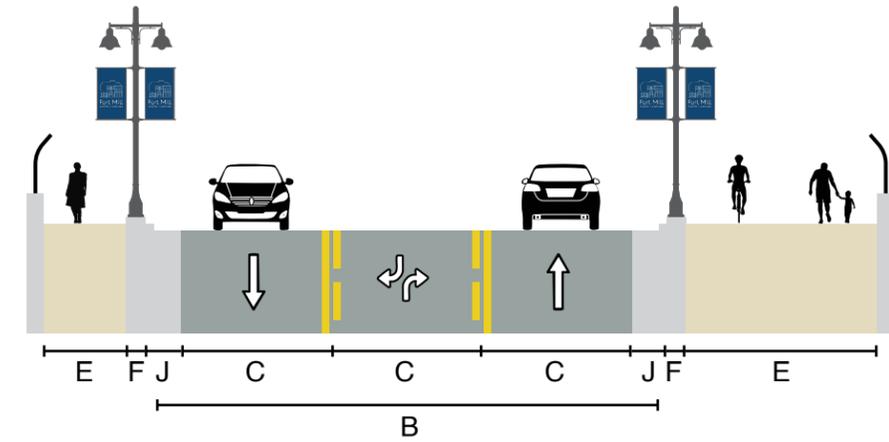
SC - 160 New Bridge Section, 61' ROW Shown
